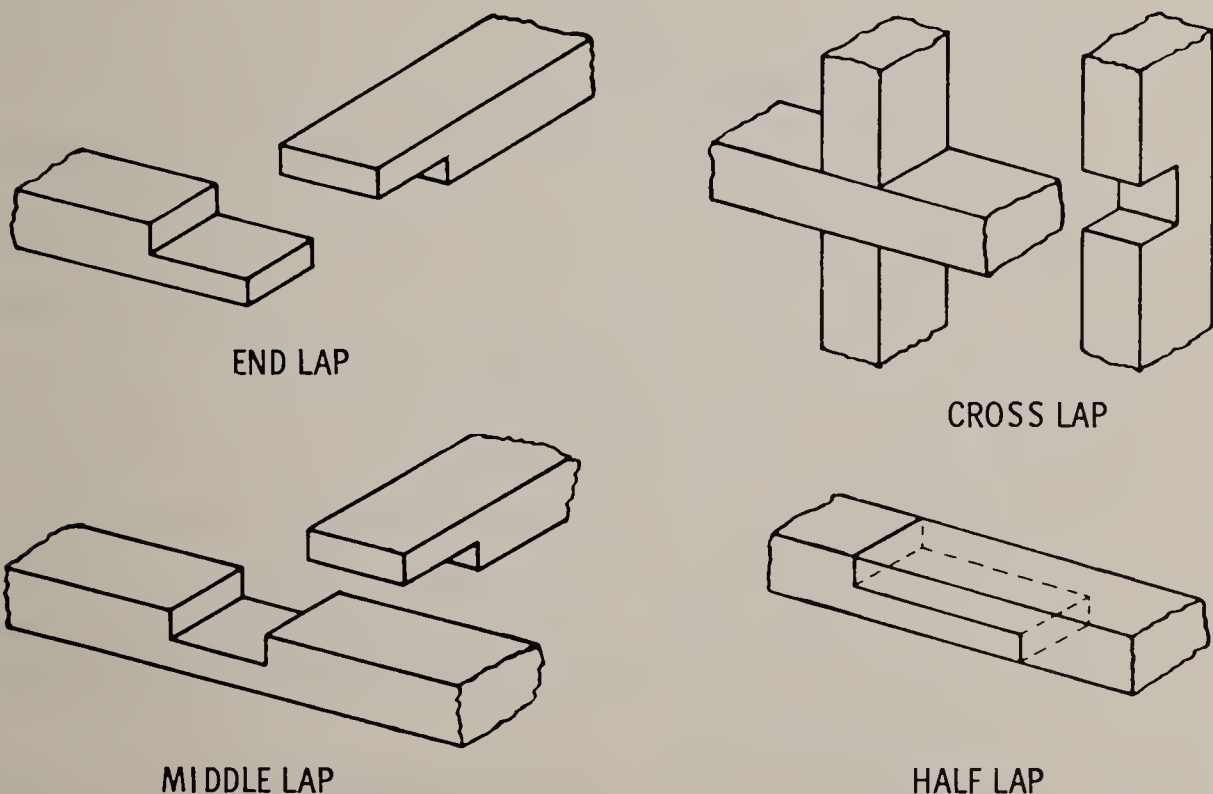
Typical lap joints. The overlapping feature furnishes a greater holding area in the joint and is therefore stronger than any of the butt or plain joints. A half-lap joint, sometimes called a scarf joint, is made by tapering or notching the sides or ends of two members so that they overlap to form one continuous piece without increase in thickness. The joints are usually fastened with plates, screws, or nails and strengthened with glue.
